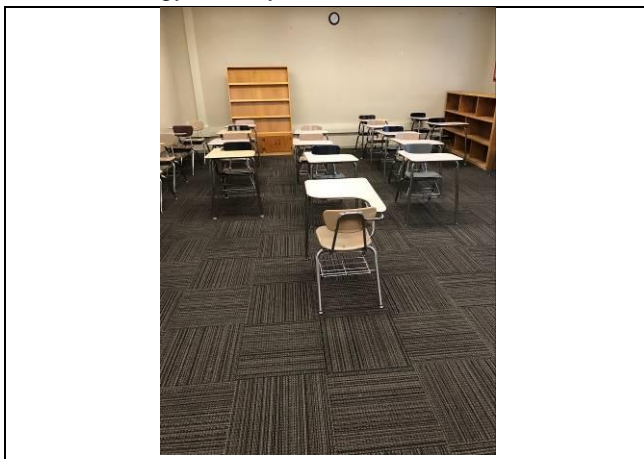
View of room A101 with carpet where floor tile was previously observed.
